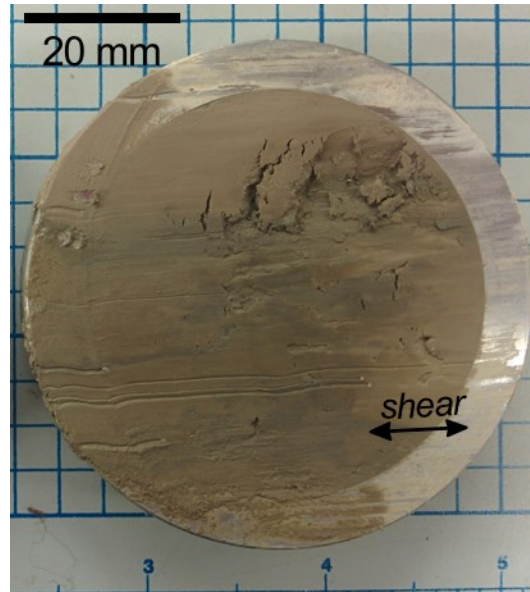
One-sided soil extrusion on direct shear test Specimen S35\_1
